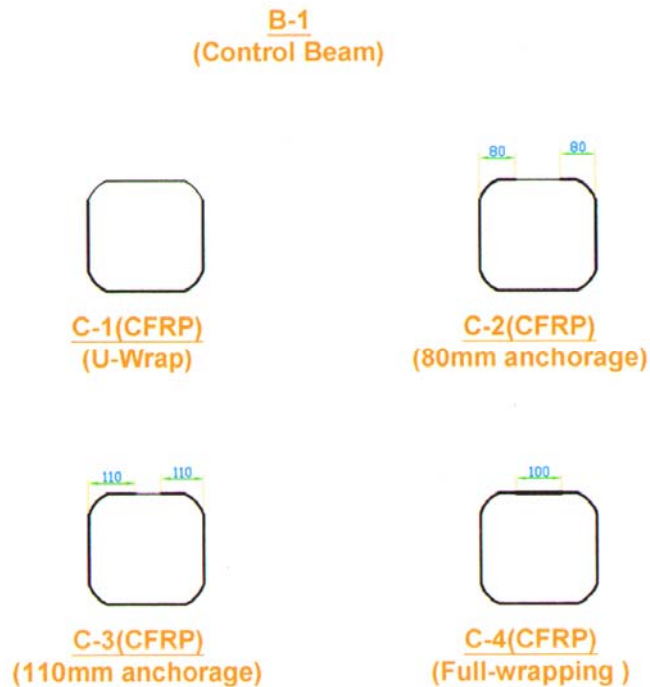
Strengthening techniques using U jacket with end anchorage ^[2]
